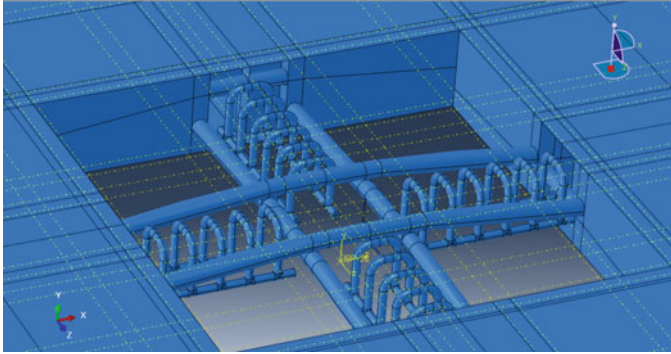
Unbonded PT Slabs Reinforcement Provide with Inverted-U Shaped Reinforcement (PTU-A)
